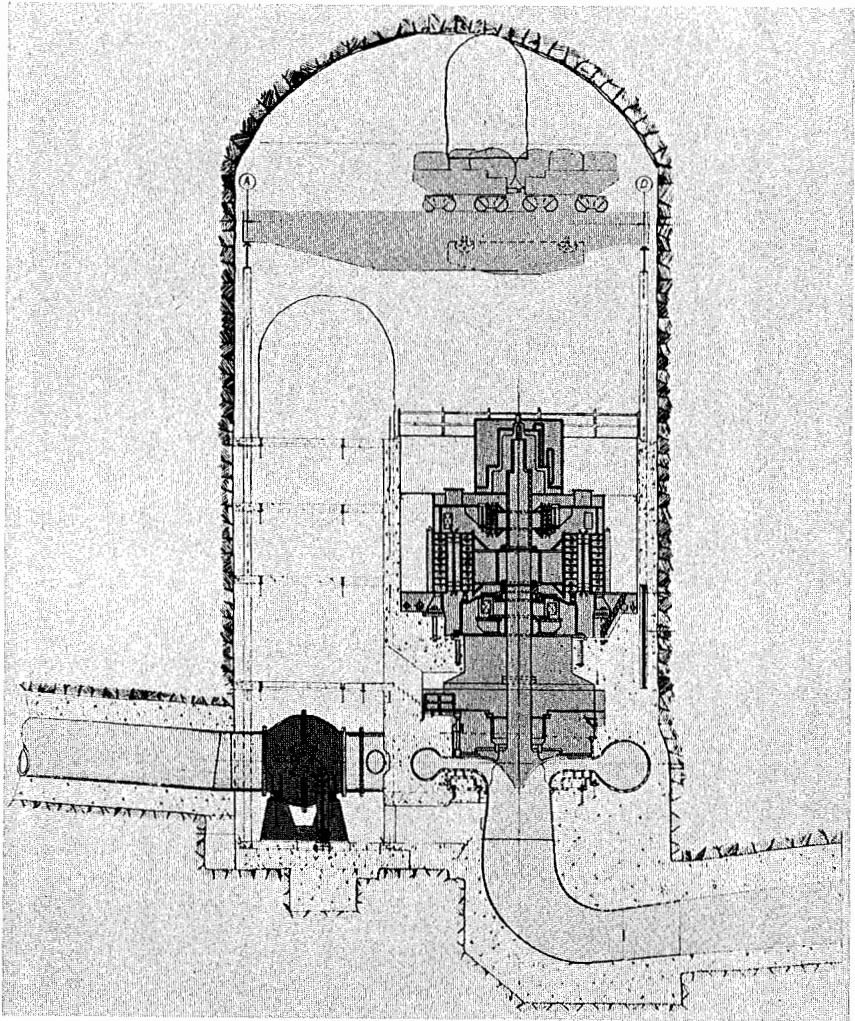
Cross Section Bear Swamp Underground Power Plant
